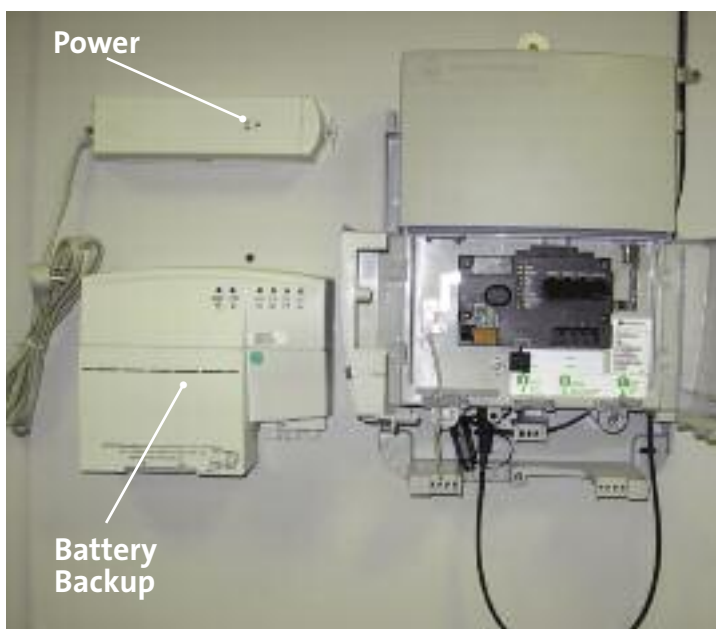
Wall-Mounted ONT with Power Supply and Back-Up Power | Photo NS114
